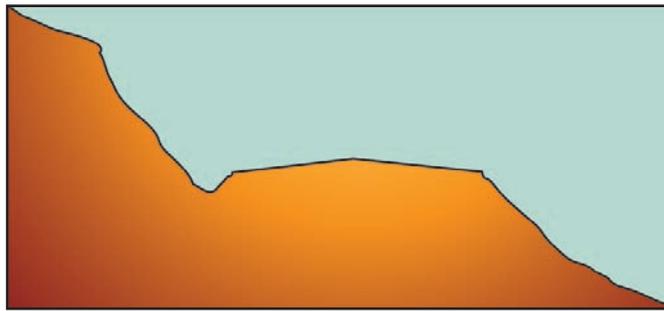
The crowned road-surface shape has a high point in the center and divides runoff between the backslope or ditch and the fillslope.
